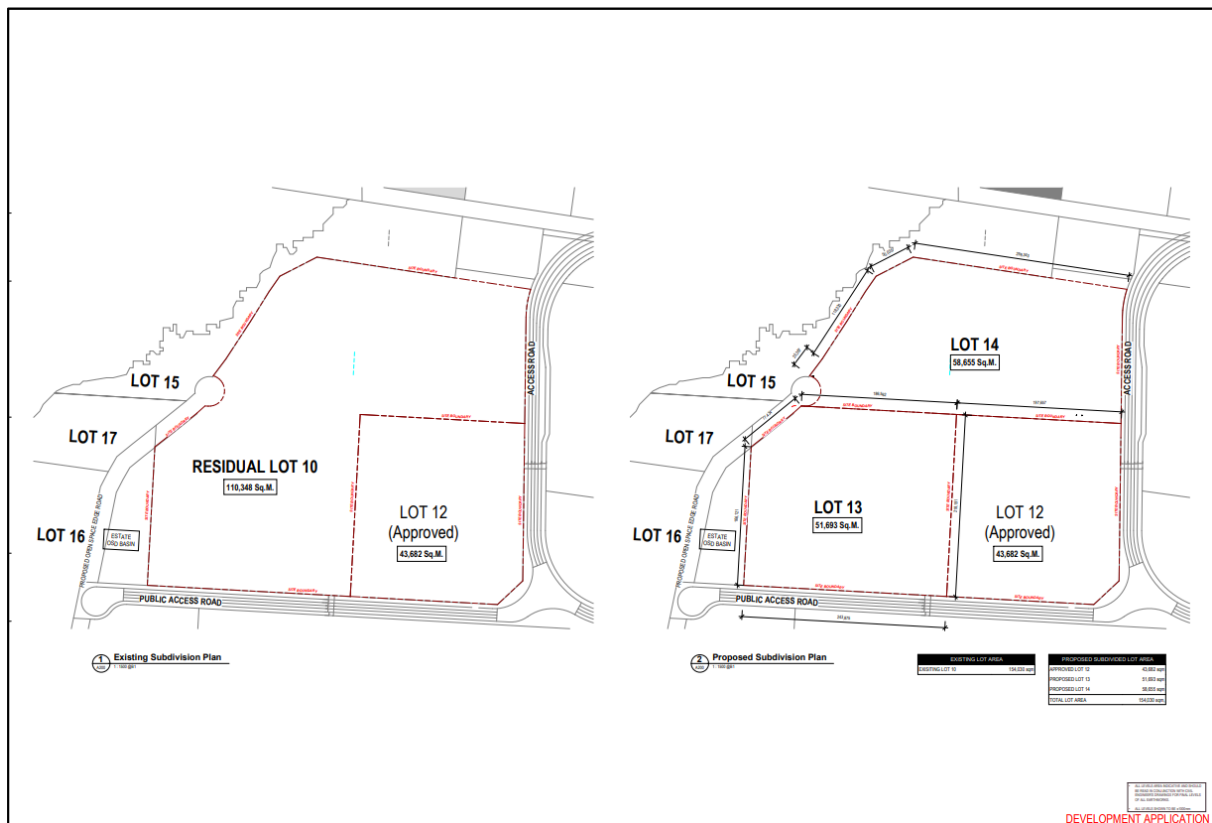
Subdivision Plan (Source: HLA Architects, 2023)
